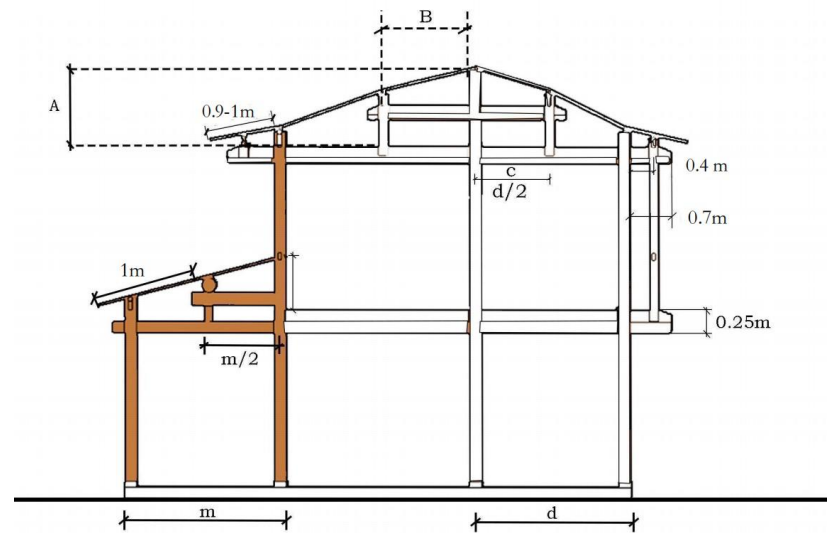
Facade dimensions of a timber structure of a traditional dwelling.
